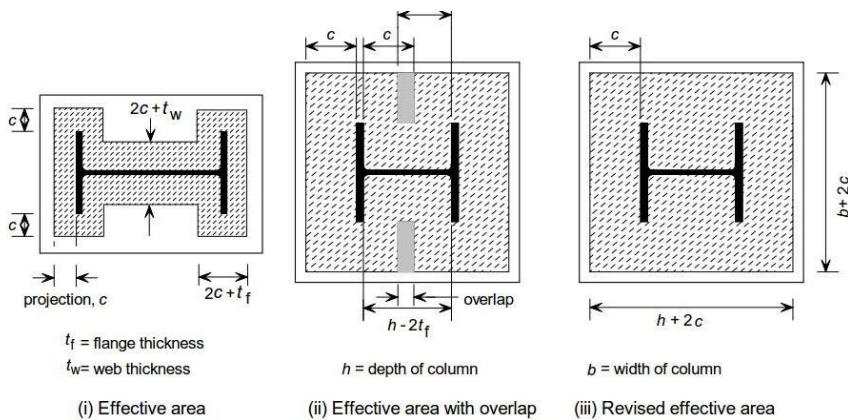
Figure showing the effective area around a column for a column base connection.
